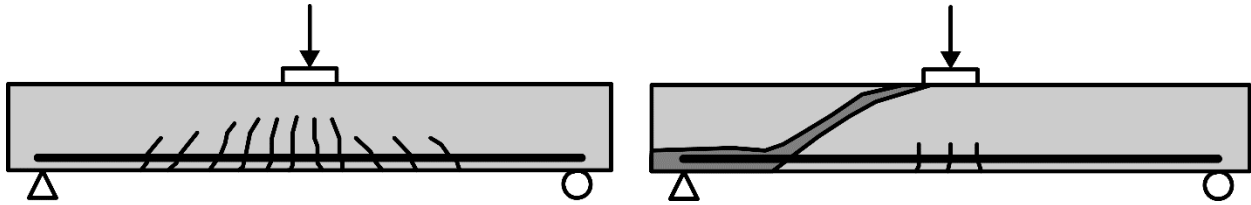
Failure modes of a concrete beam undergoing a) flexural failure and b) shear failure; adapted from [48]
